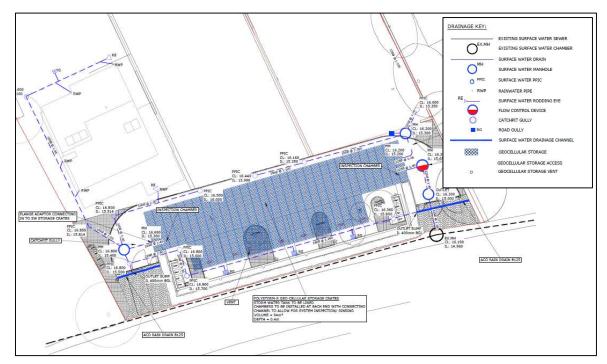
Surface water drainage layout for Property C, Joy Lane, Whitstable.
